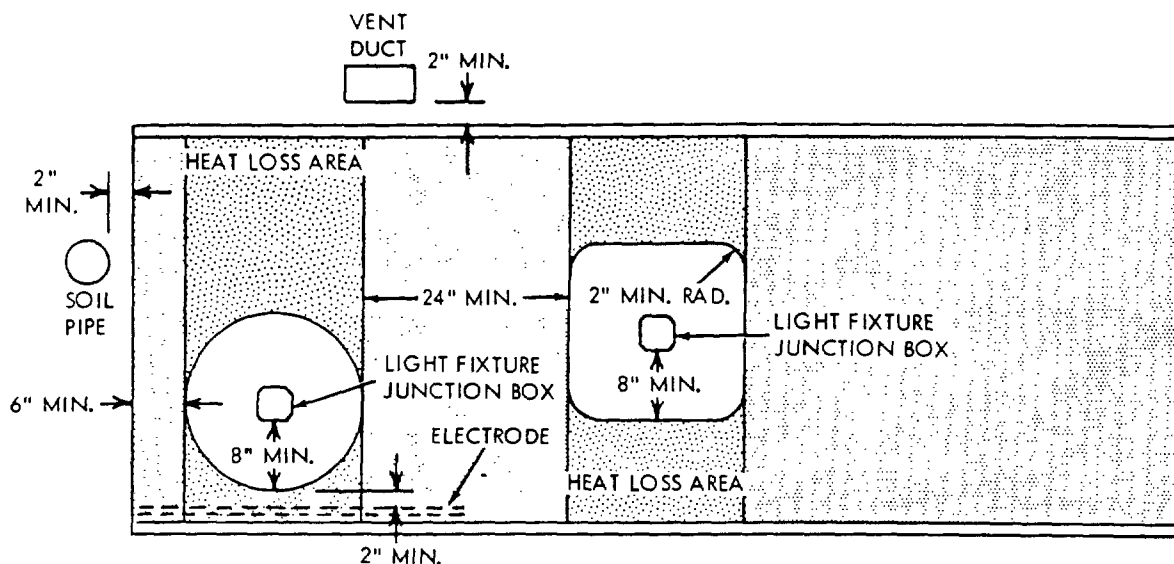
Clearances Required by Typical Cutouts in a Heating Panel
